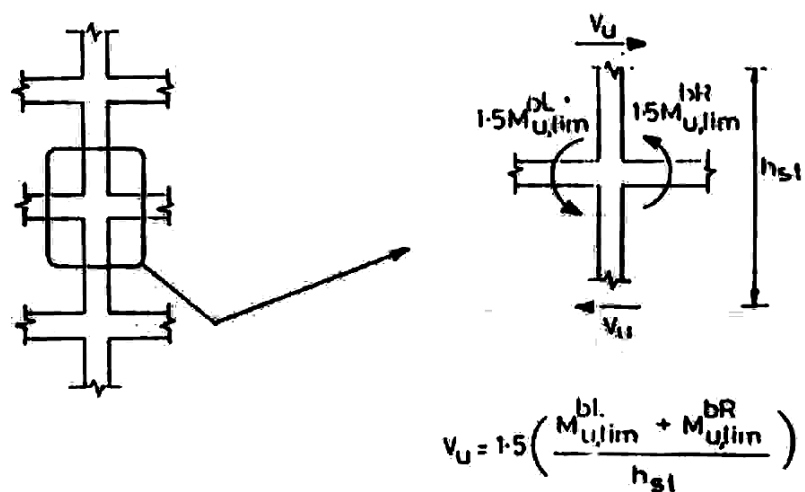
CALCULATION OF DESIGN SHEAR FORCE FOR COLUMN
